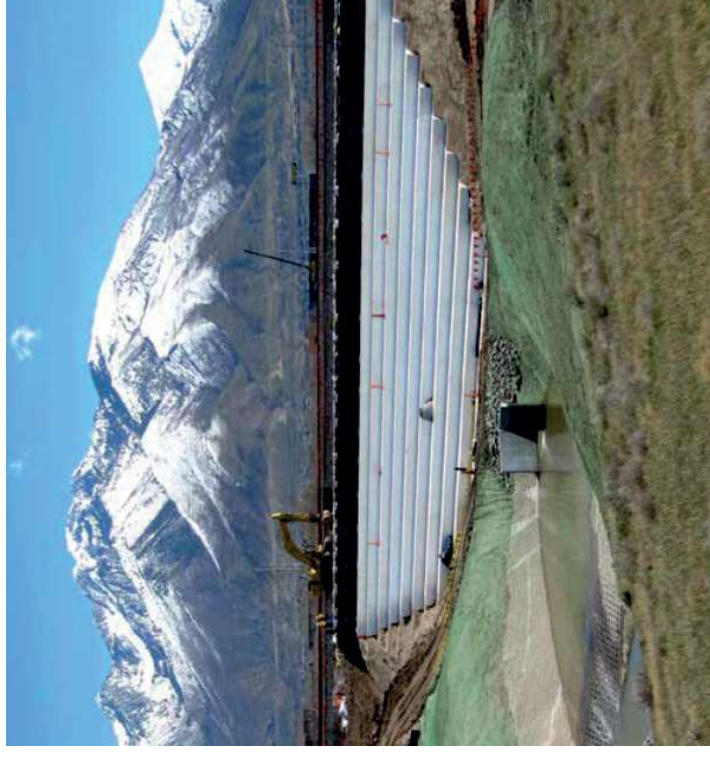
An application where geofoam block fill constructed atop a single cell reinforced concrete culvert: The railway embankment widening was constructed using geofoam blocks to prevent differential settlements which may cause structural damage in the culvert. (Draper/Utah/A.B.D.), (Bartlett et al., 2015)
